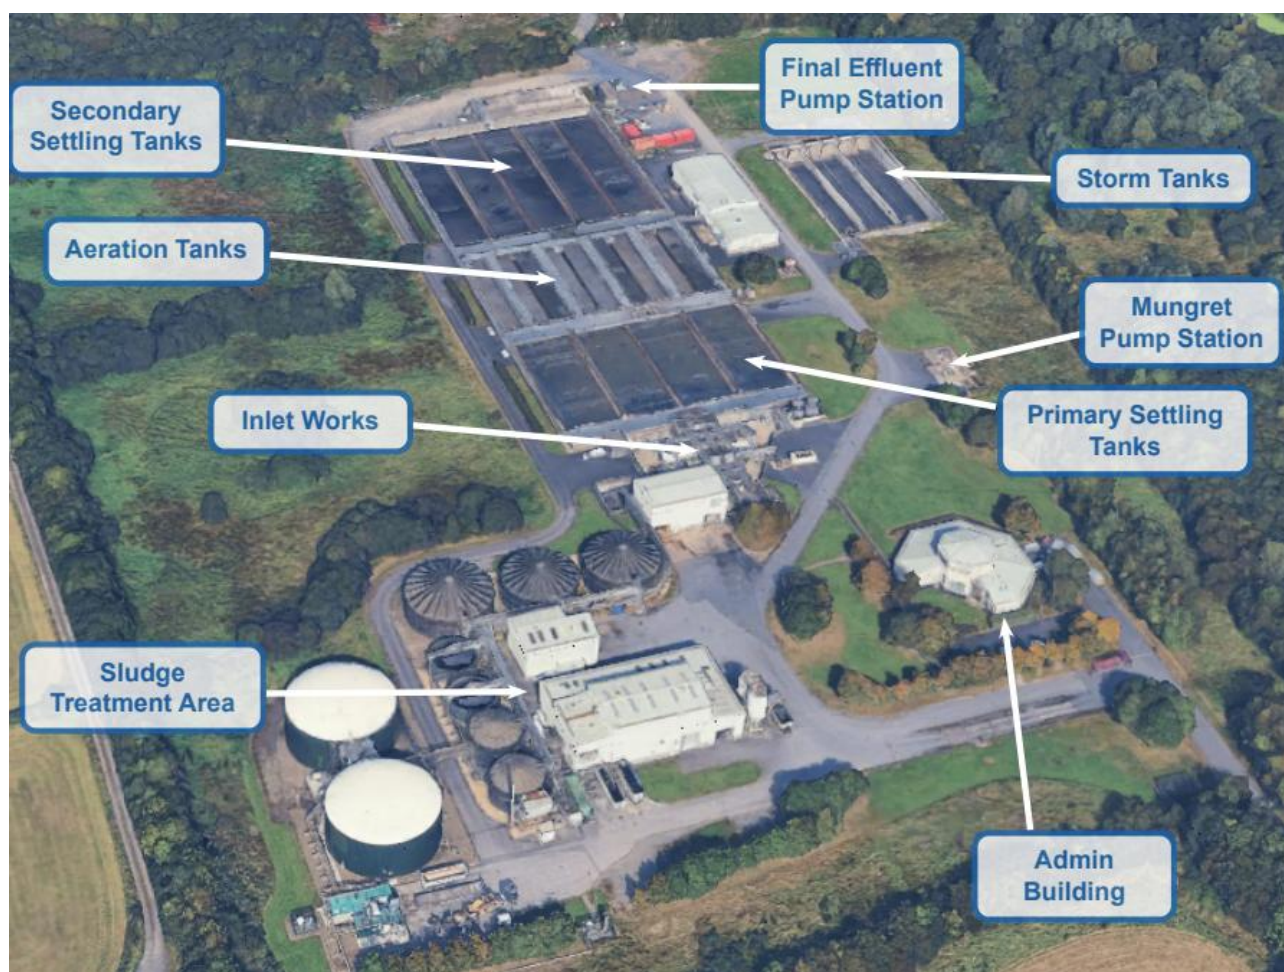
EXISTING LAYOUT PLAN OF LIMERICK WWTP
